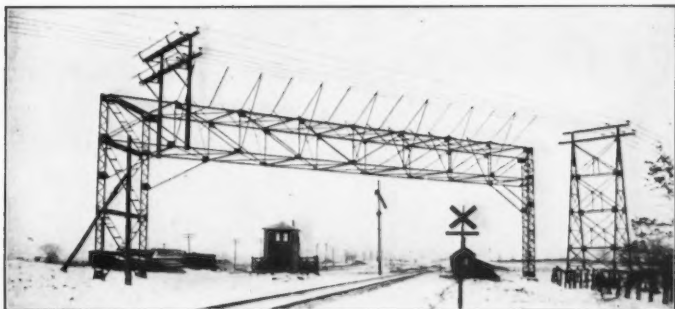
GUARD BRIDGE, TO PROTECT RAILROAD TRACKS.
